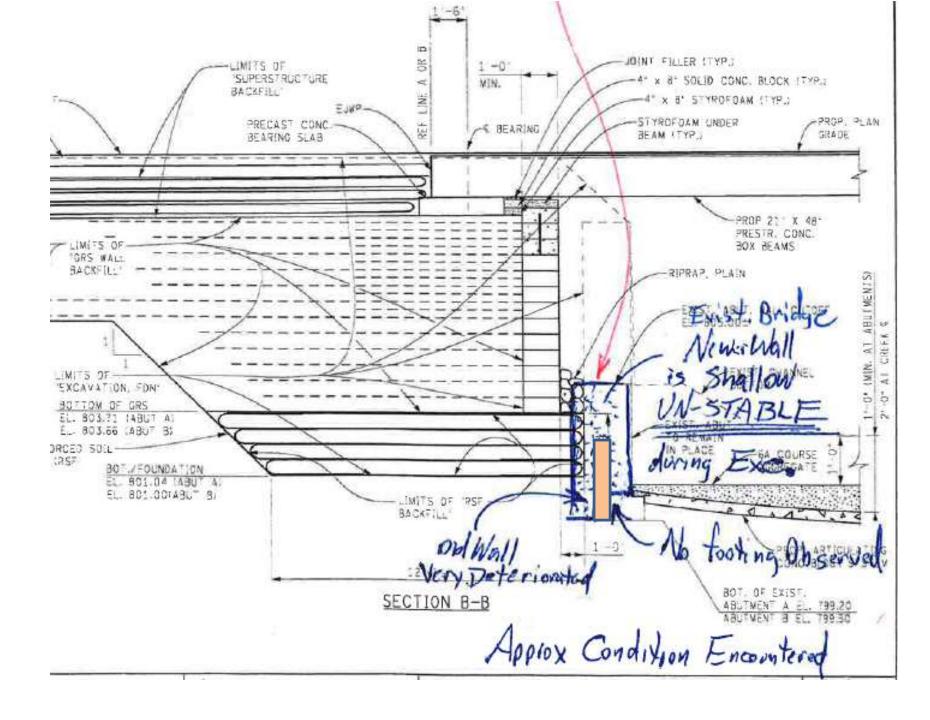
Illustration. Cros ection of GRS-IBS built behind an existing concrete abutment.
